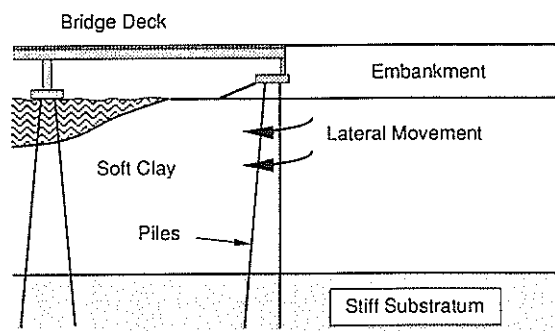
Piled bridge abutment subjected to horizontal soil movements
